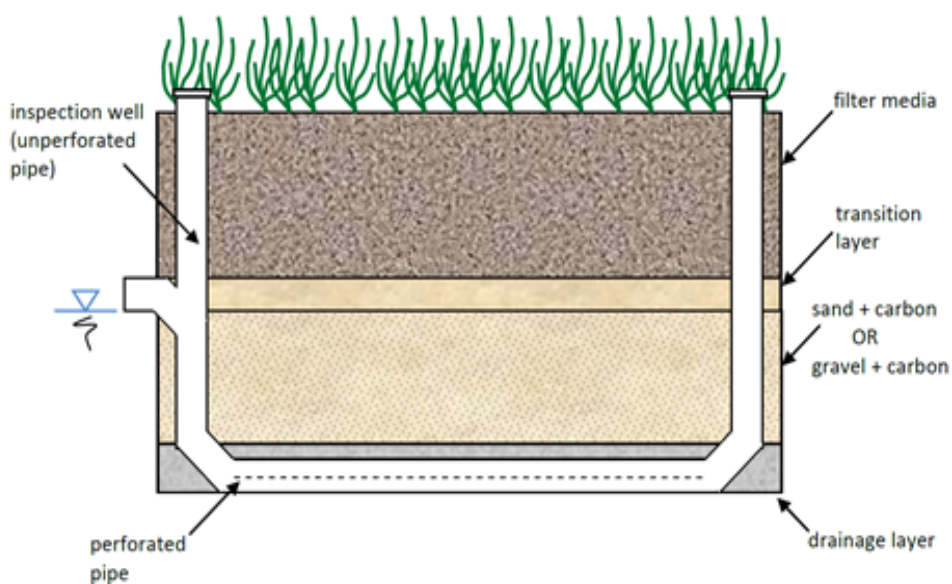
Raingarden long section showing a submerged zone and an underdrain (Monash University, 2009)
